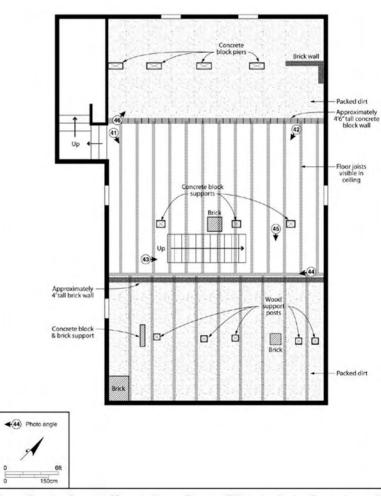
Floor plan of basement of former dwelling, as of November 2012, showing direction of interior photographic views.
